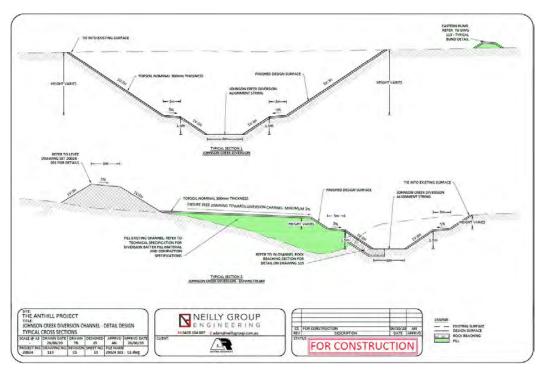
Neilly Group Engineering (2020) typical Johnson Creek diversion design sections 1 and 2
